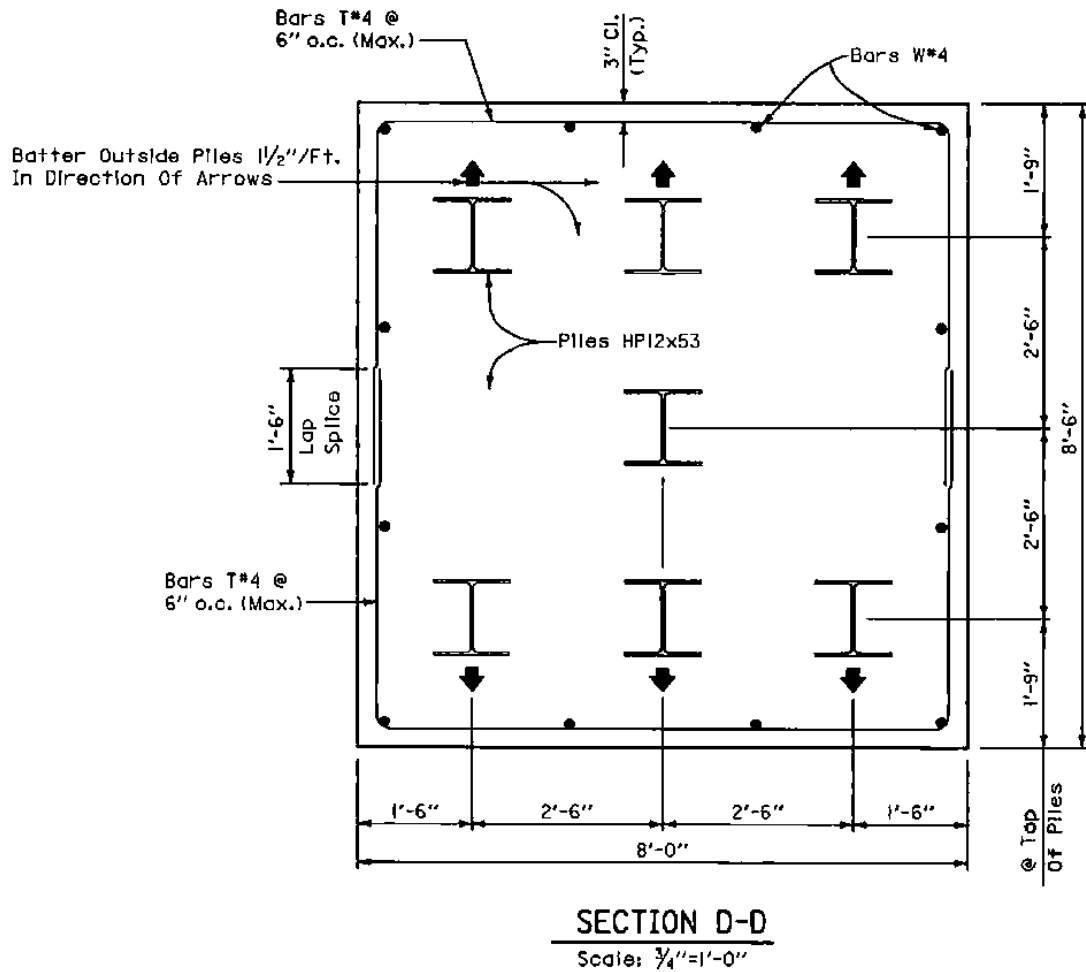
Etowah County Bent 2 typical pile footing layout (ALDOT 2011)
